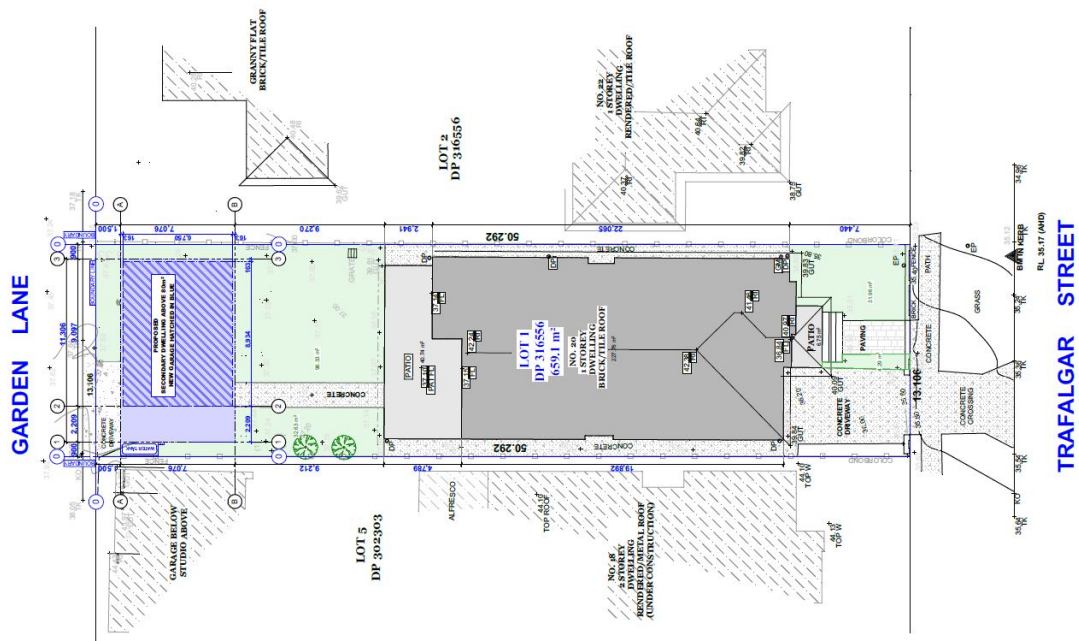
Site Plan of 20 Trafalgar Street, Belmore
